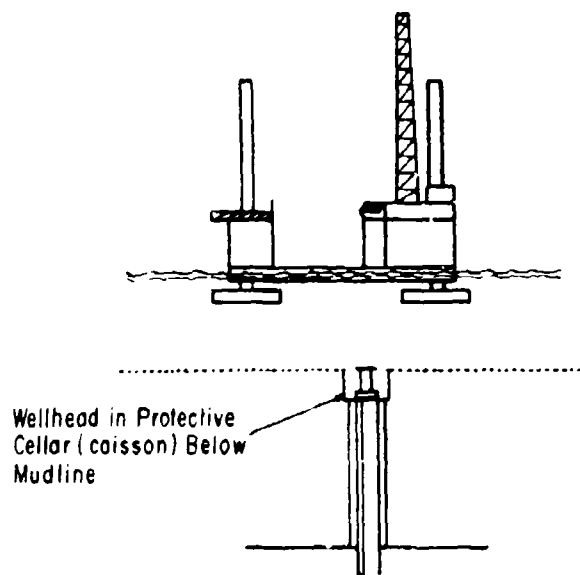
Jack-up Rig with Legs Withdrawn, Awaiting Towing and Positioning at New Drill Site.
